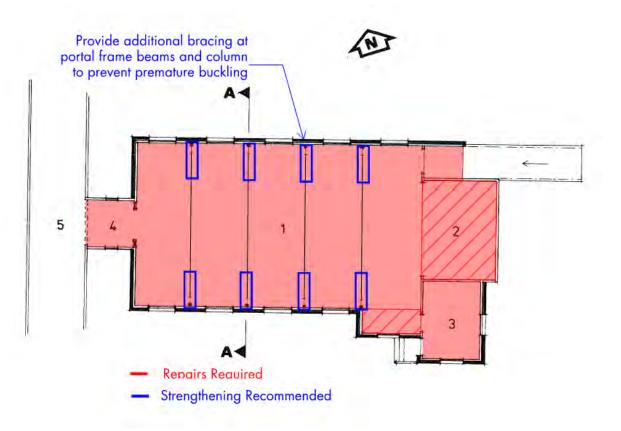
Reflected Ceiling Plan – Strengthening with Fly Braces
